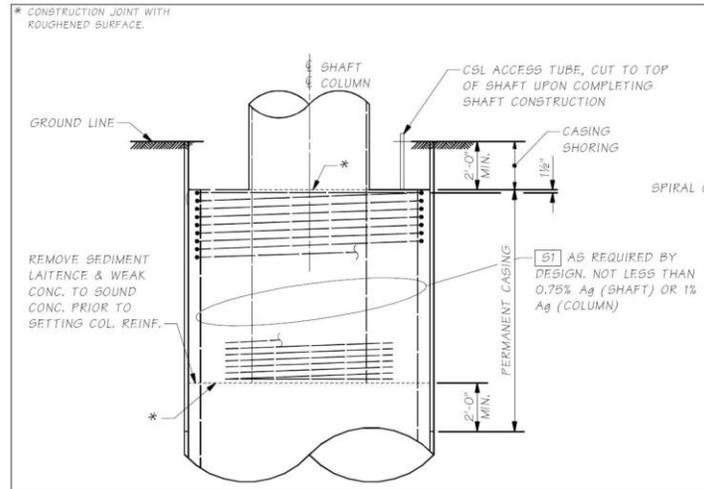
85 Connection of Pier Column to Large Diameter Drilled Shaft (Source: Washington State DOT Bridge Design Manual) [8].
